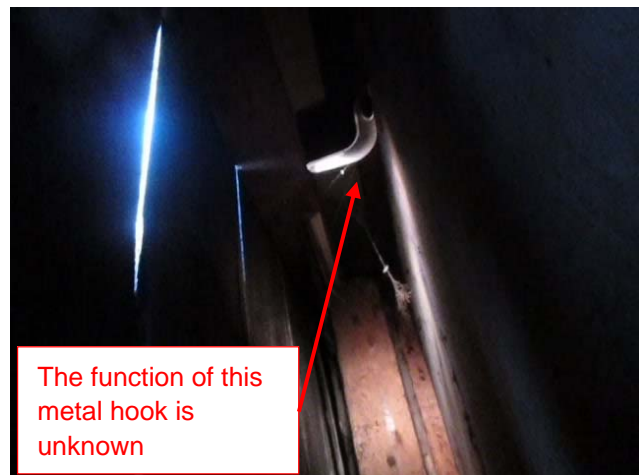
View looking down towards Platform 2 and a view looking up towards Platform 2 in Panel 10
